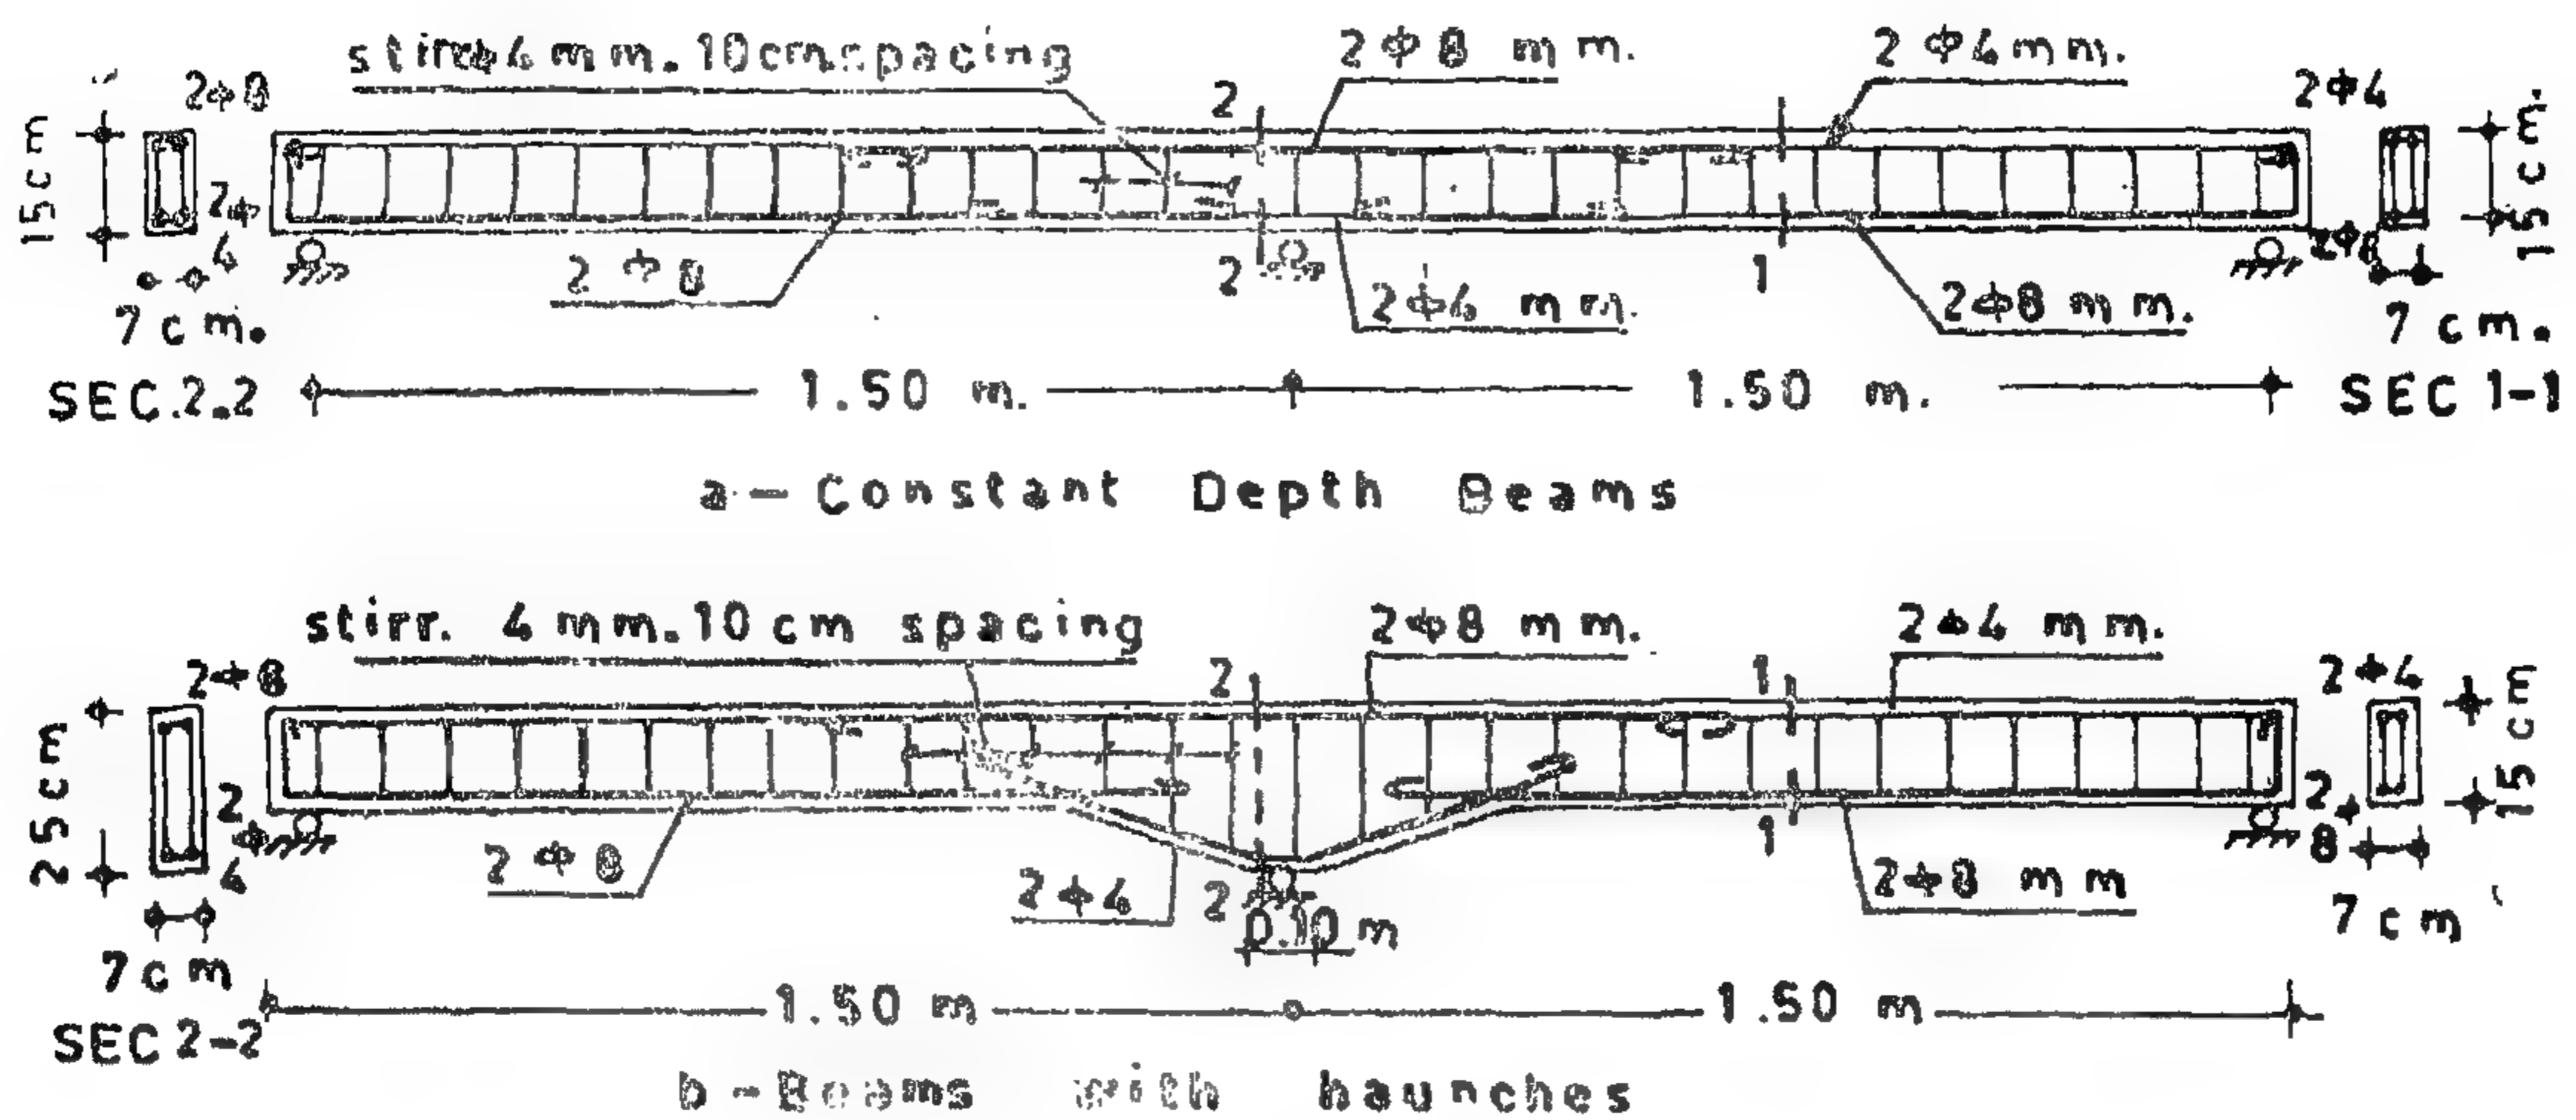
BEAMS REINFORCEMENT DETAILINGS.
